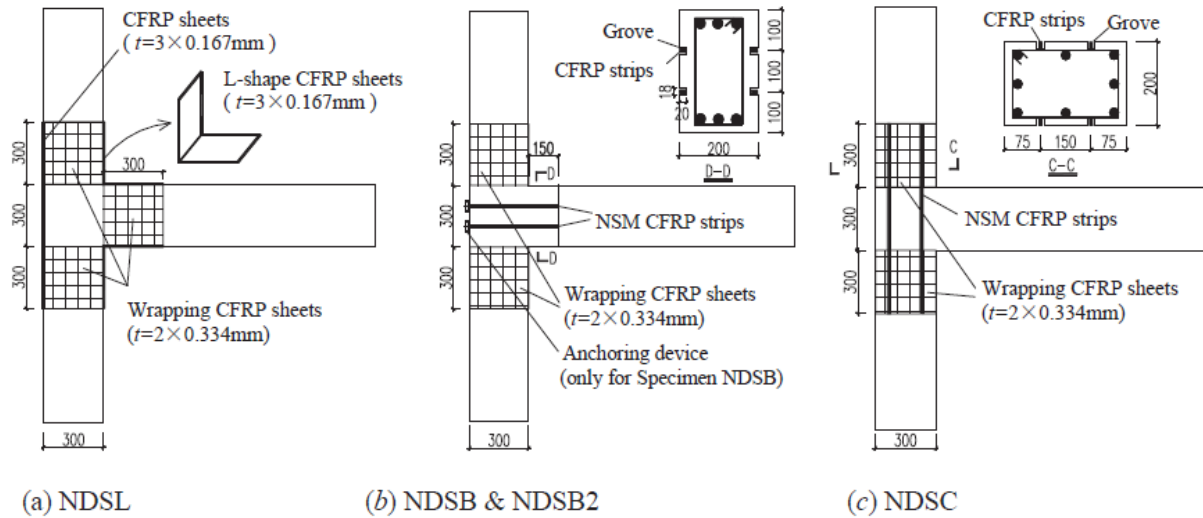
Schematic representation of near surface mounted technique [9].
